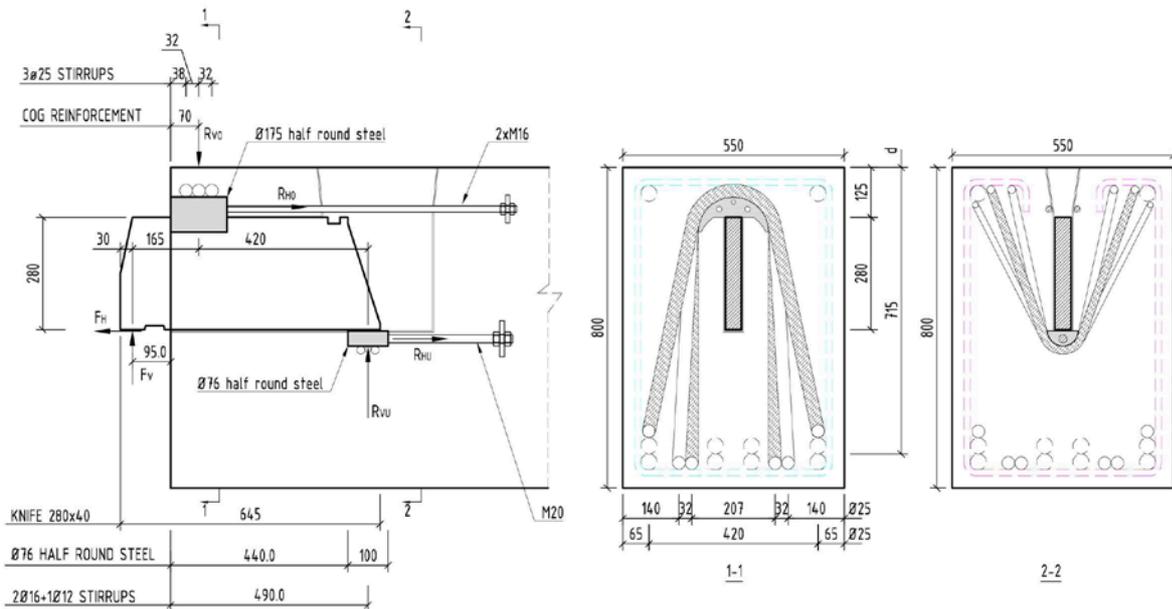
BSF 700 Beam unit. Situation I-nominal values on cantilever and location of anchoring reinforcement.
